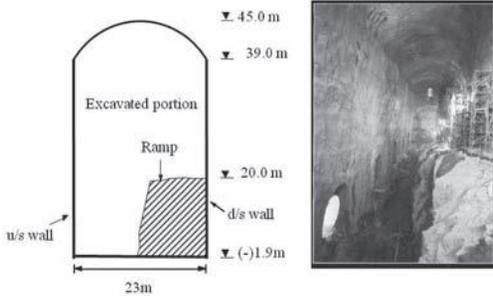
Position of the ramp and view of the underground power house cavern before excavation of the ramp.
